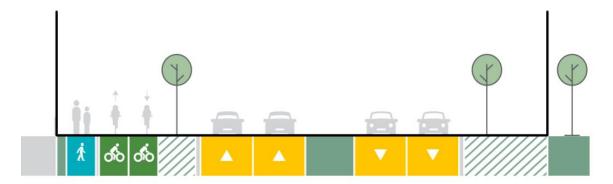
Indicative Access Road Upgrade cross section for rural section
